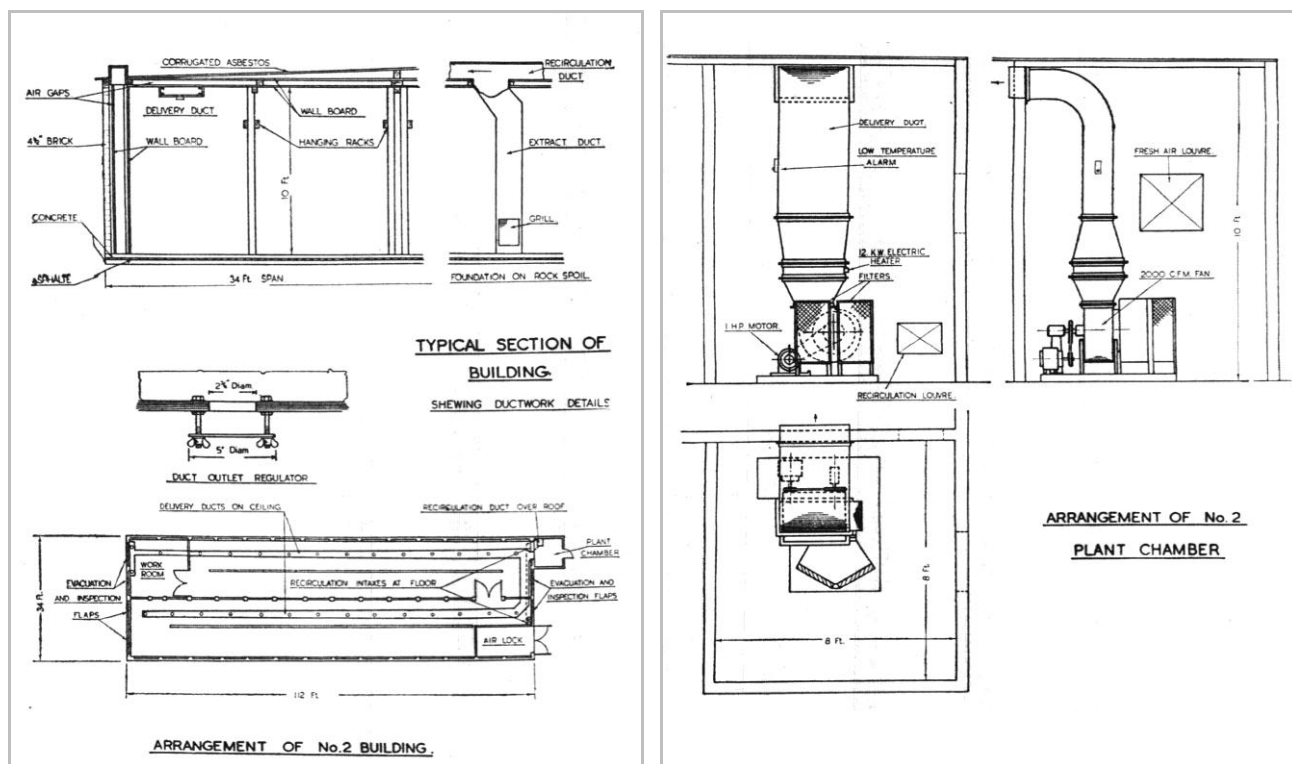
Plan and section of a repository in Manod Quarry (Building No.2) with details of the ductwork (left); plant chamber with details of the air conditioning system machinery (right)
